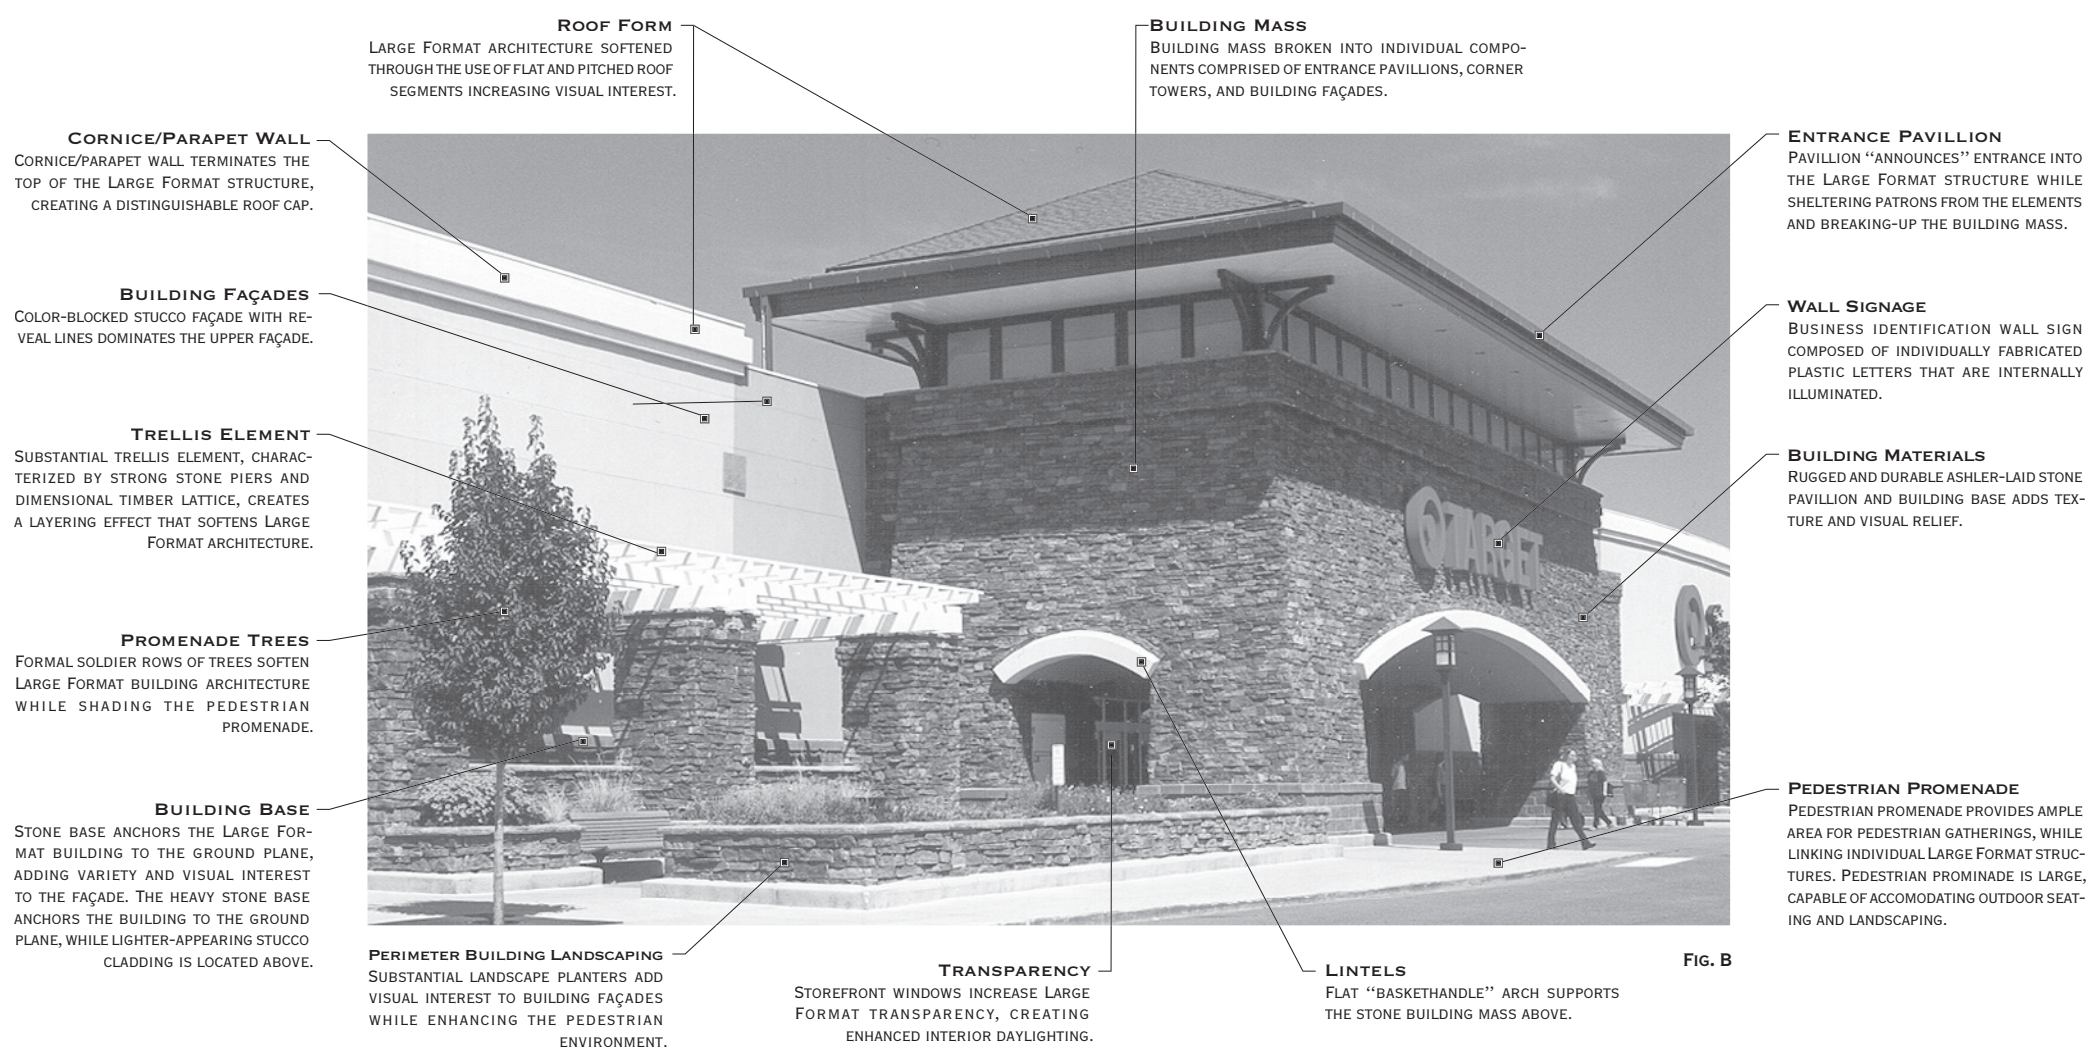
USE BUILDING MATERIALS TO ADD TEXTURE AND VISUAL INTEREST. NOTICE HOW THE RUGGED STONE BASE VISUALLY ANCHORS THE LARGE FORMAT BUILDING TO THE GROUND PLANE, WITH LIGHTER STUCCO WALLS OCCURRING ABOVE.
